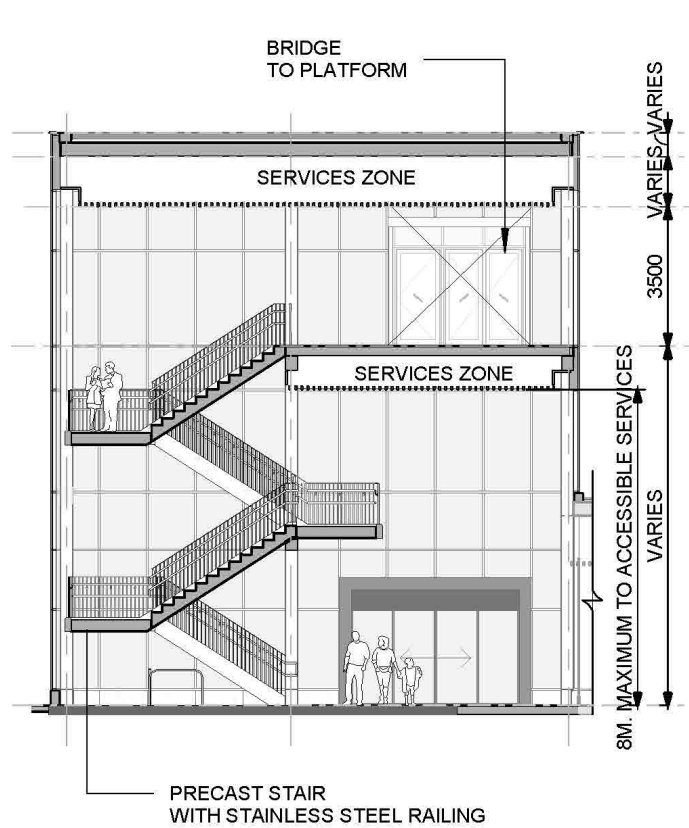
Cross Section of Platform Access Module (Bridge configuration)
